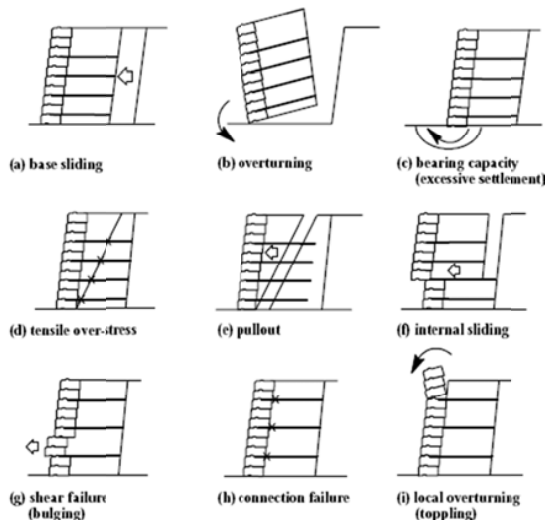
Different Modes of Failure of Reinforced Earth Retaining Walls under Static and/or Seismic Conditions [2]
